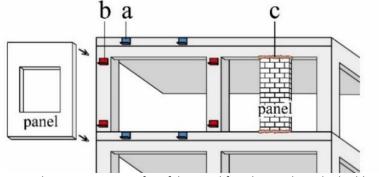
Dry and wet connection of prefabricated facade panels to the building structure
